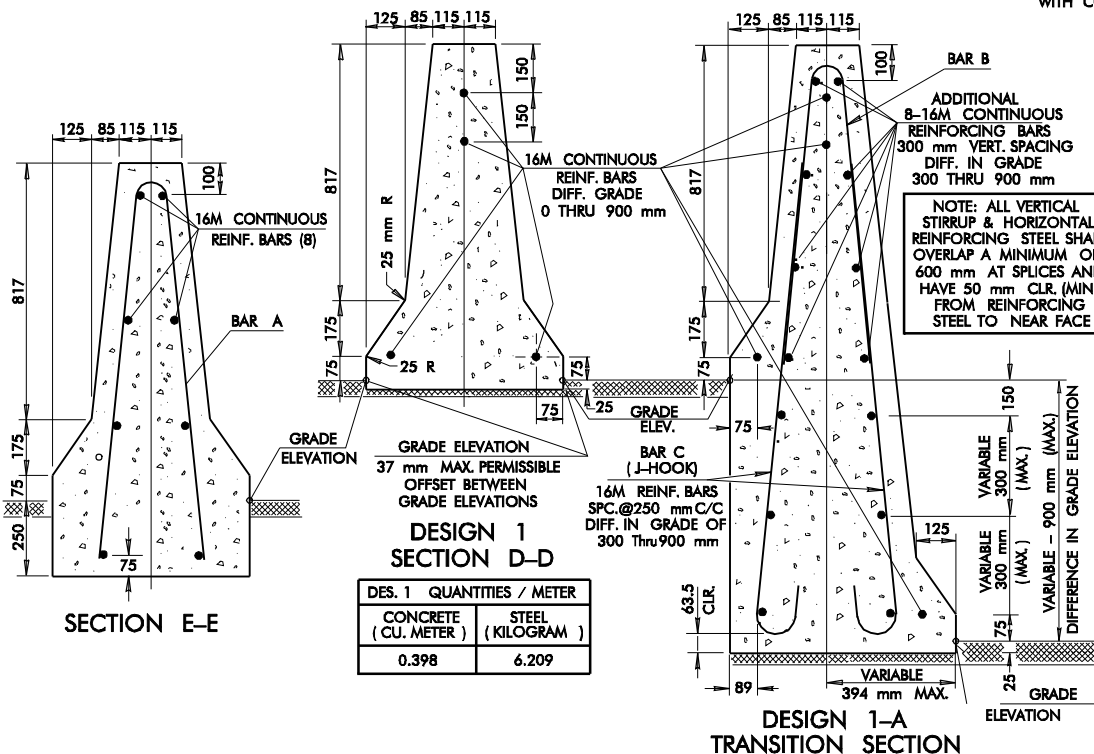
DETAIL OF TRANSITION SECTION AT BRIDGE PIERS
